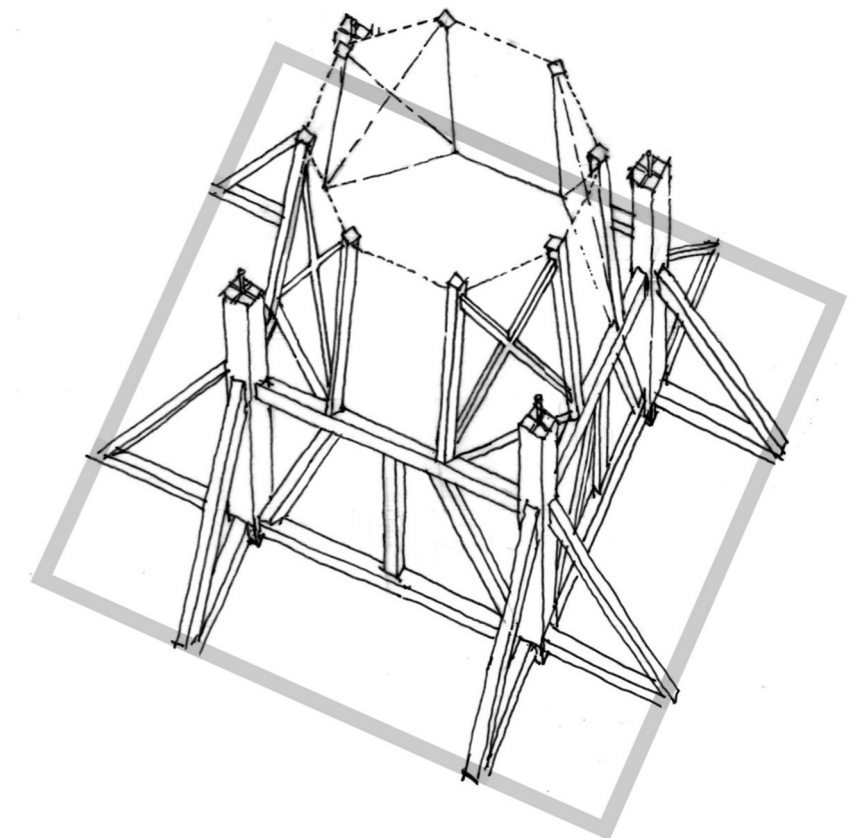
Ramsau, dome construction (Kayser + Böttges, prev. Barthel + Maus)
